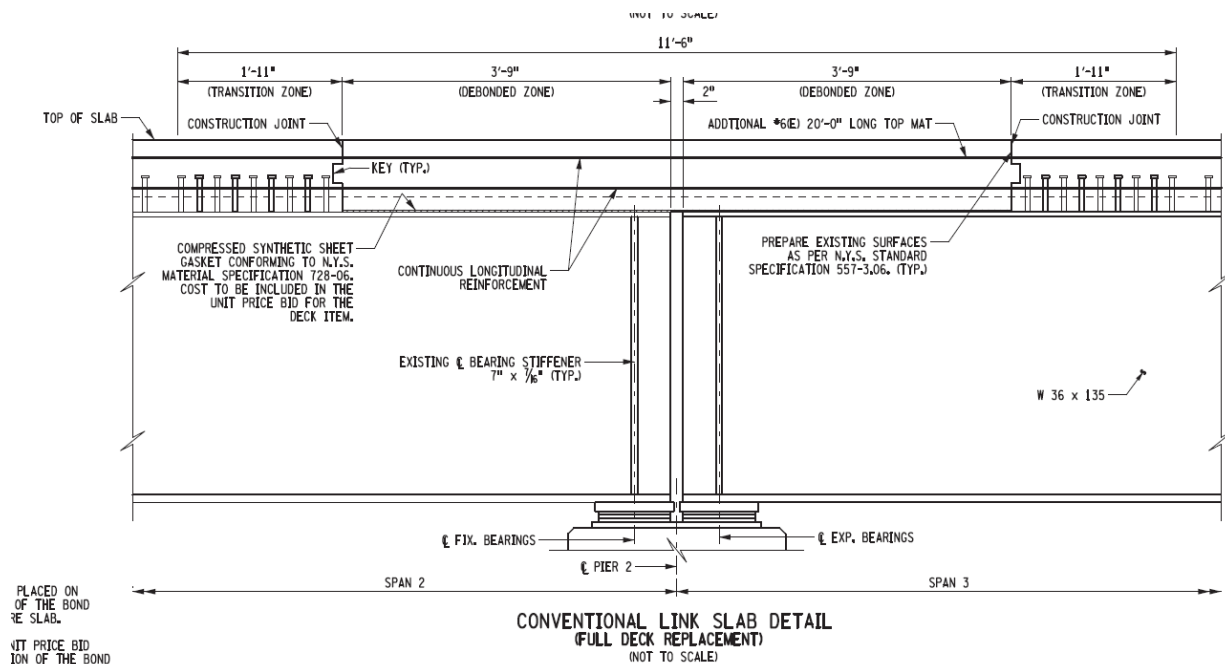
Conventional concrete link slab detail for full-depth deck replacement (NYSDOT)
